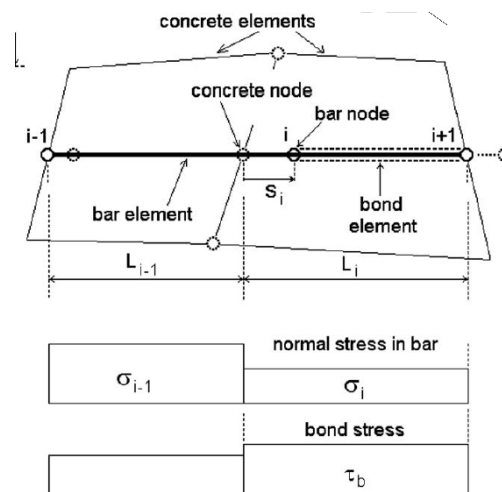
System of reinforcing bar with bond embedded in a concrete element, adapted from Jendele and Cervenka (2006).
